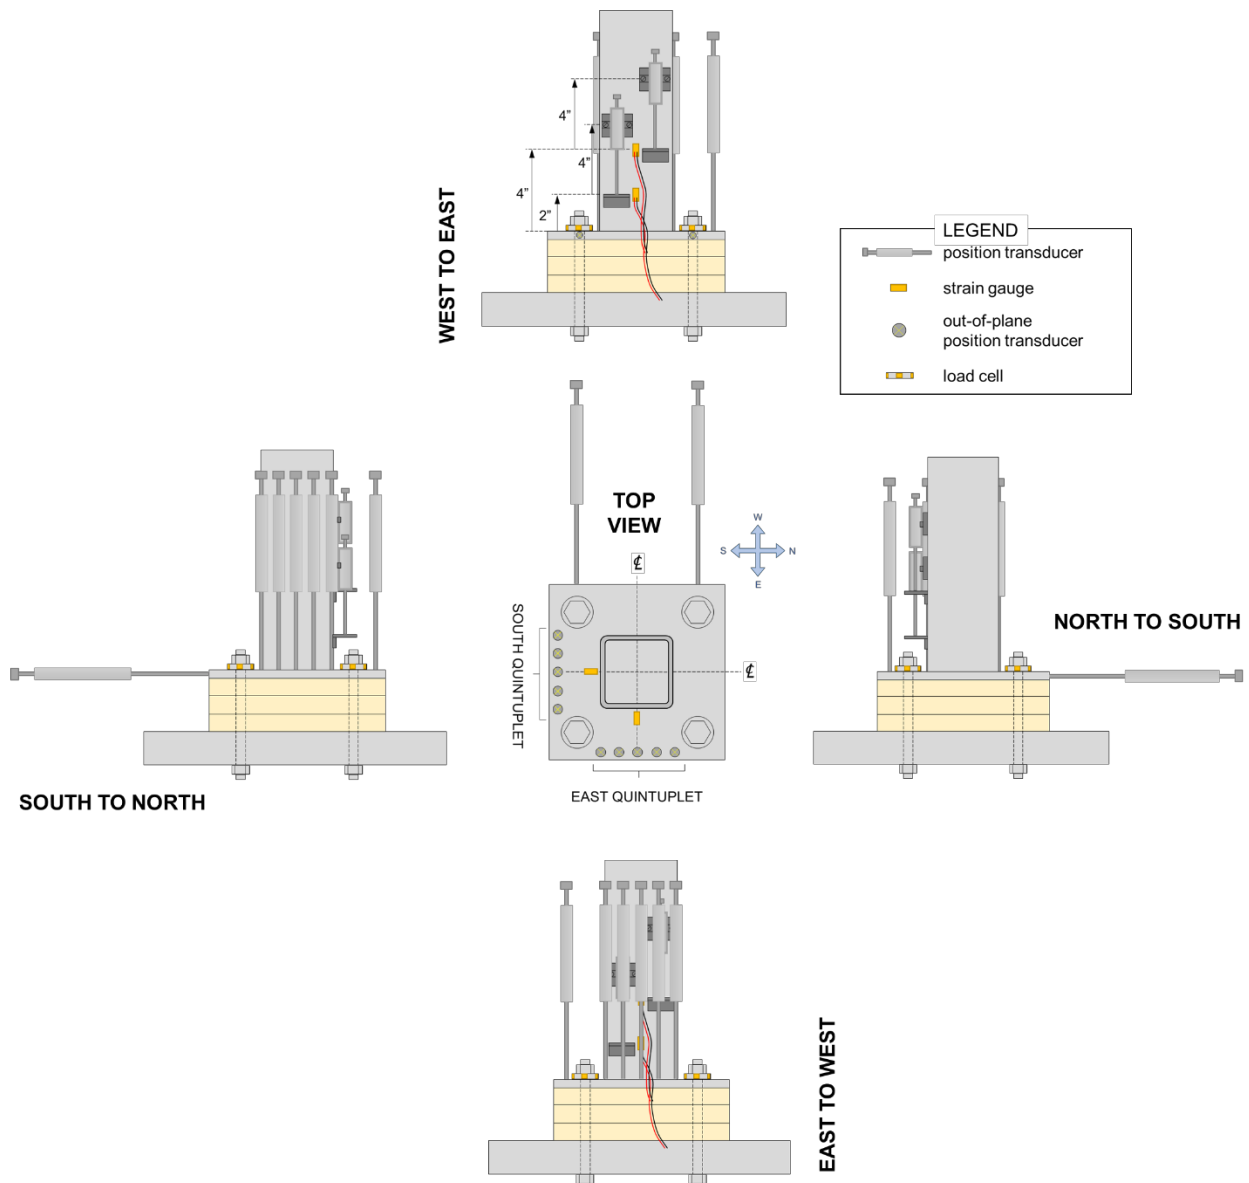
Sensor configuration for roof post and canopy beam specimens, with views from each direction
